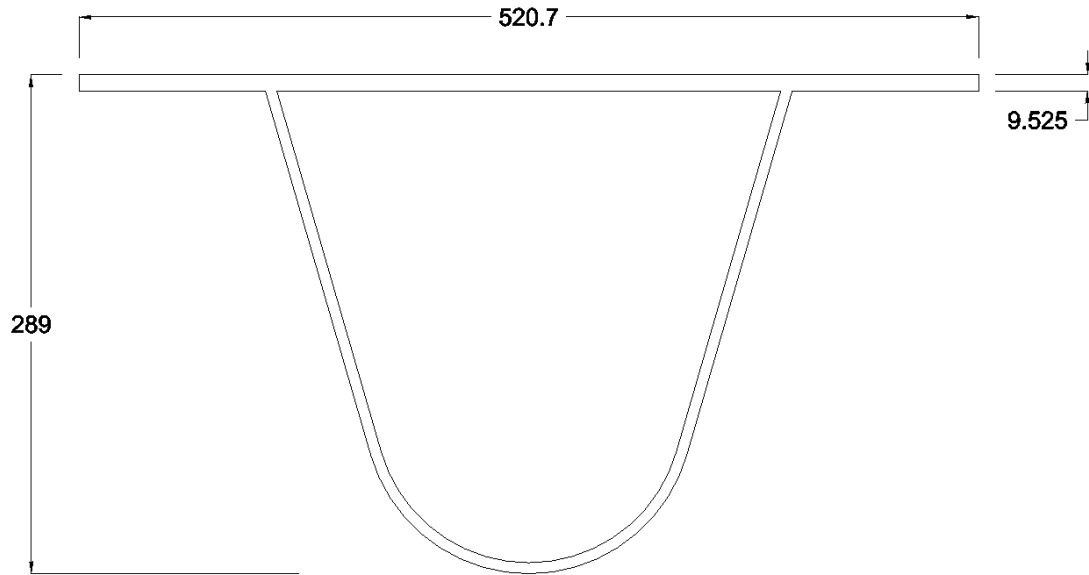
Nominal dimensions for type C specimen (all dimensions in mm).
